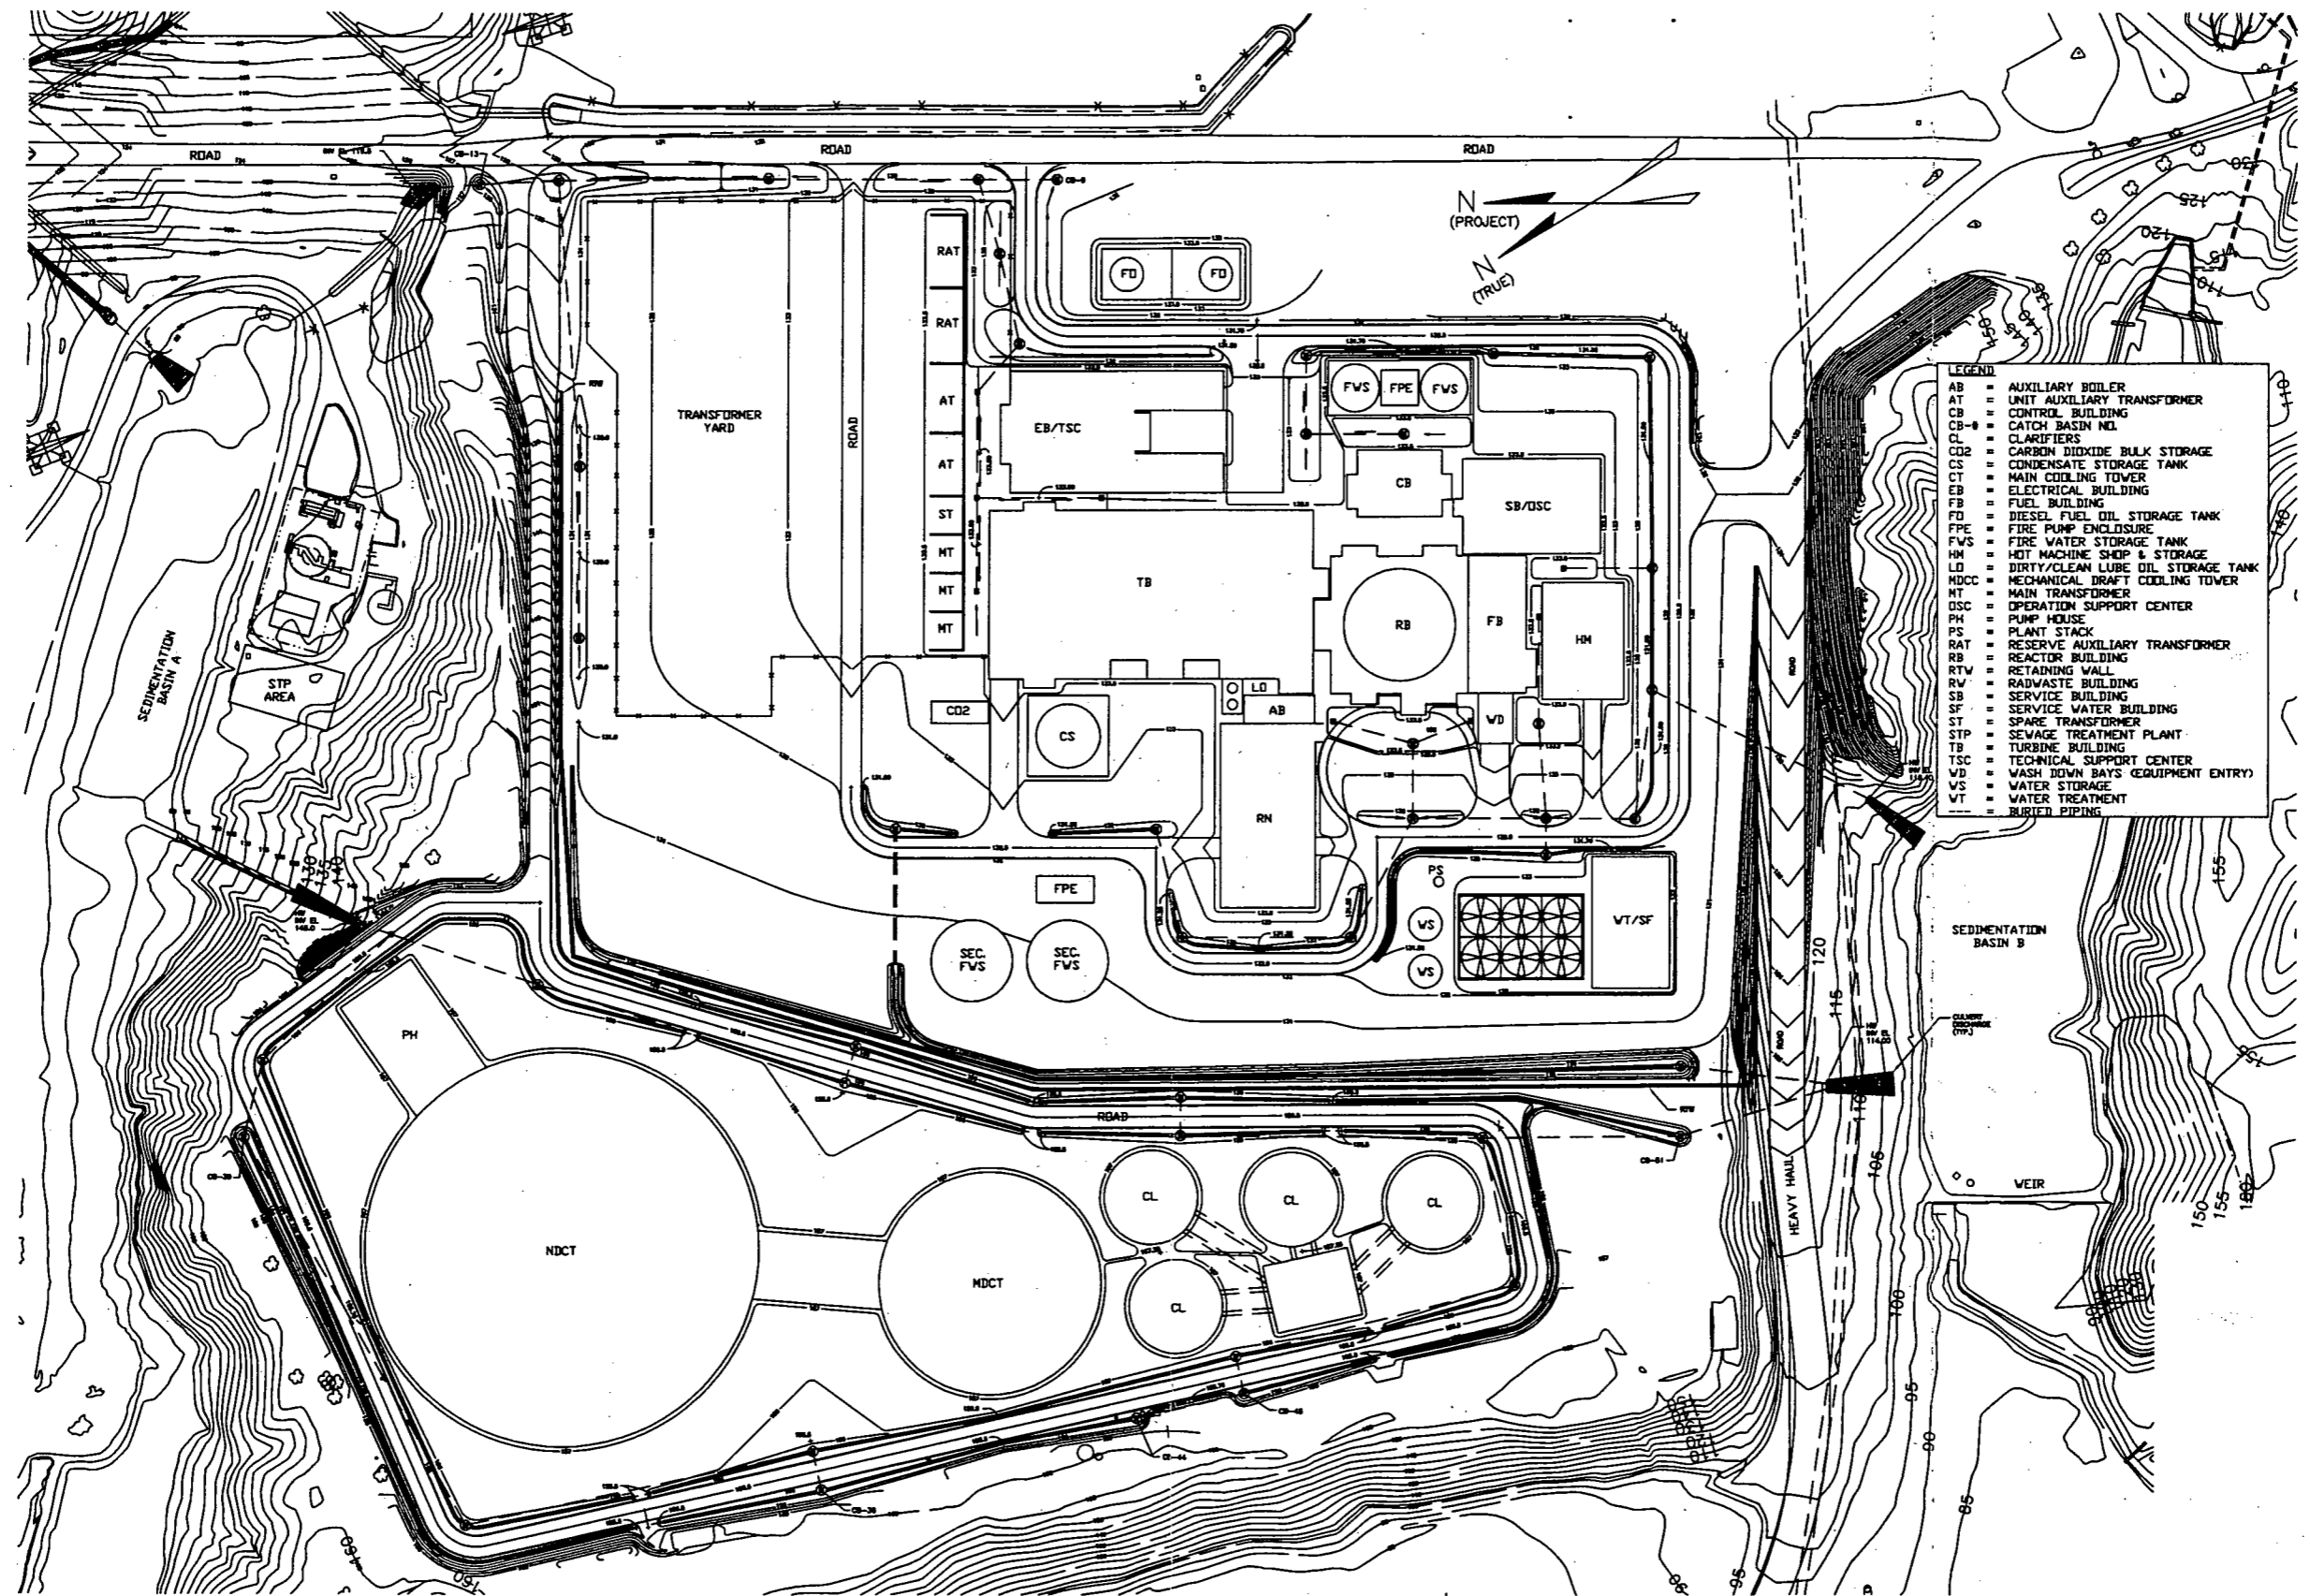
UNIT 3 LAYOUT AND DRAINAGE PLANS
